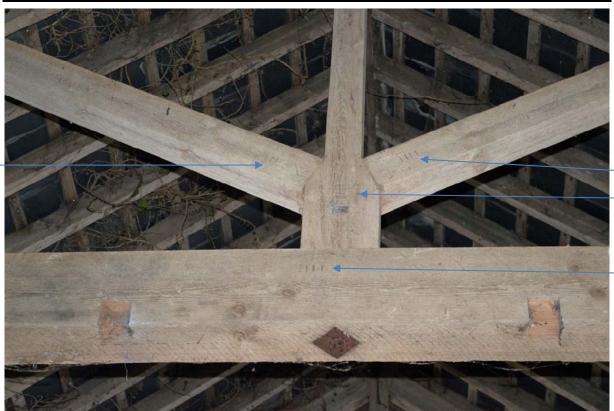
Examples of carpentry marks on trusses in the barn, facing south (GIL18-0057)
